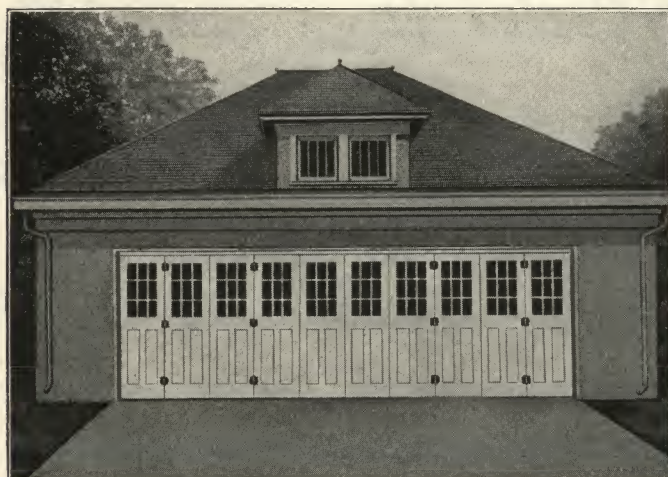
Slidetite doors lend character to a garage. Being narrow they allow narrow glass panels to be used and an individual door construction that always has a splendid appearance.
